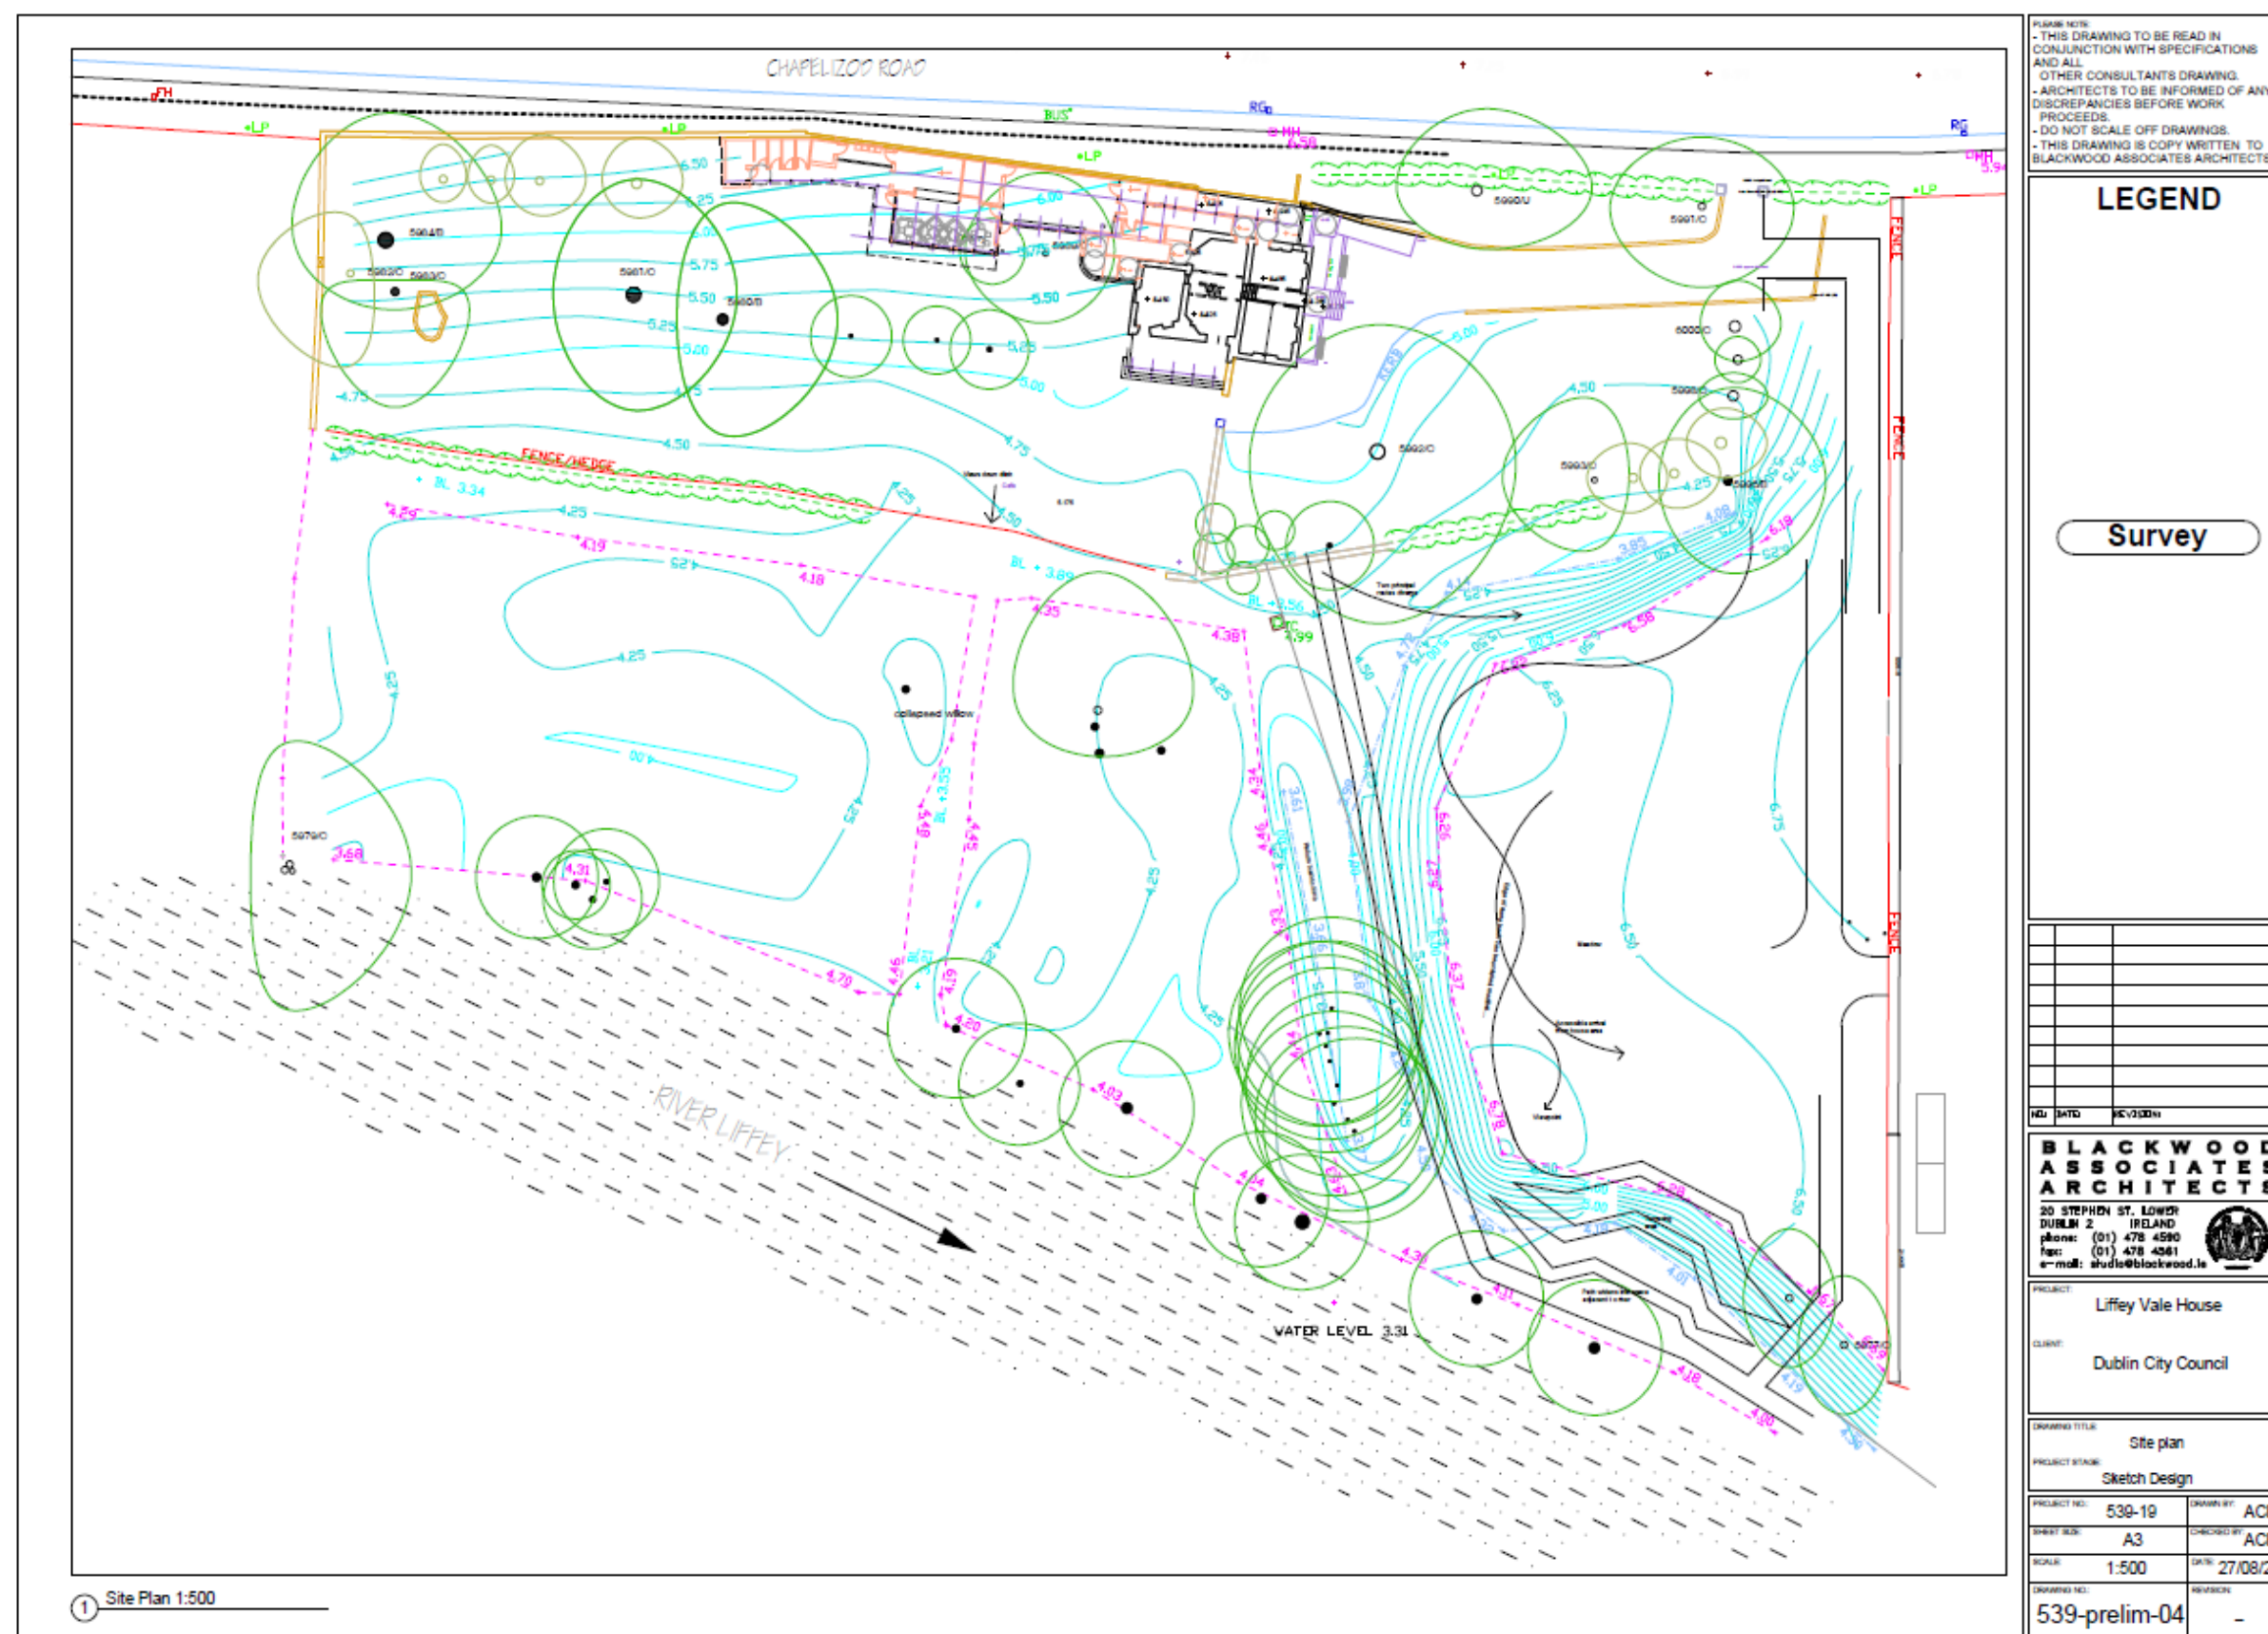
Proposed site plan (Drawing No. 539-prelim-04)
